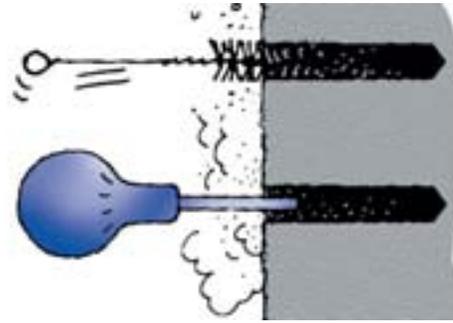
Wire brush and rubber syringe for cleaning holes.
